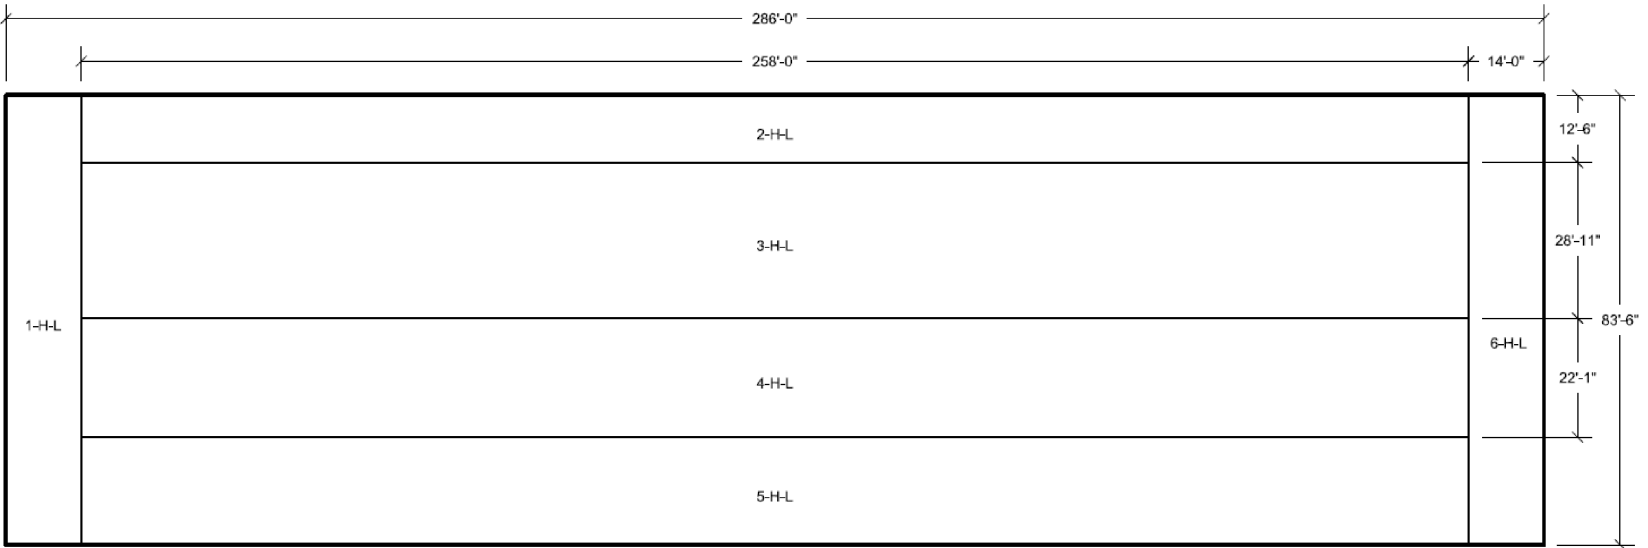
H.6-89 UHS Basin South Wall Looking North Horizontal Reinforcement Zones Far Side Face
